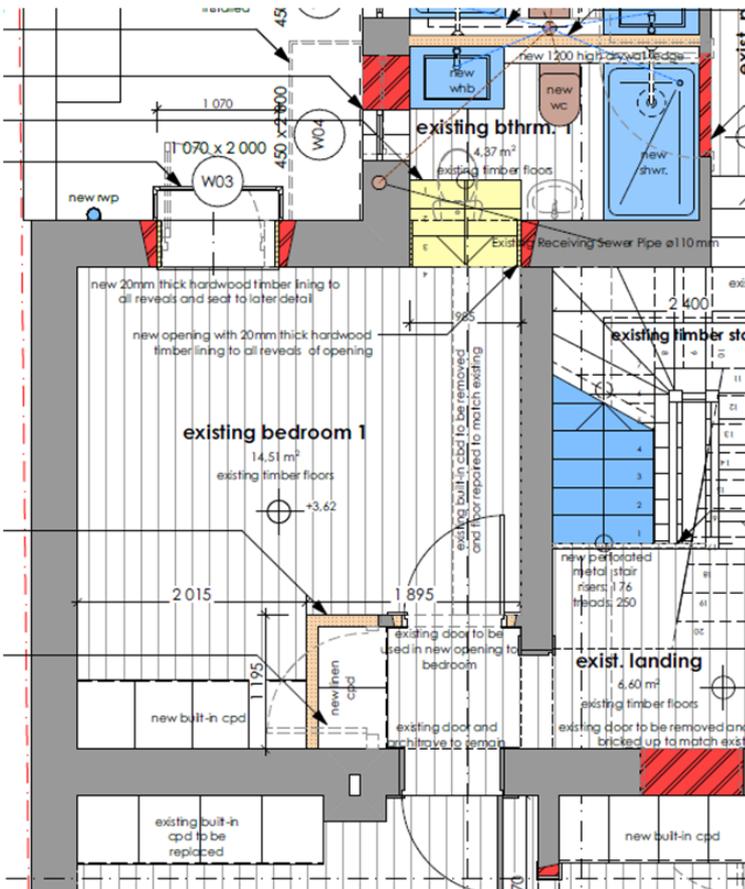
Proposed work: convert altered bathroom to two separate bathrooms
